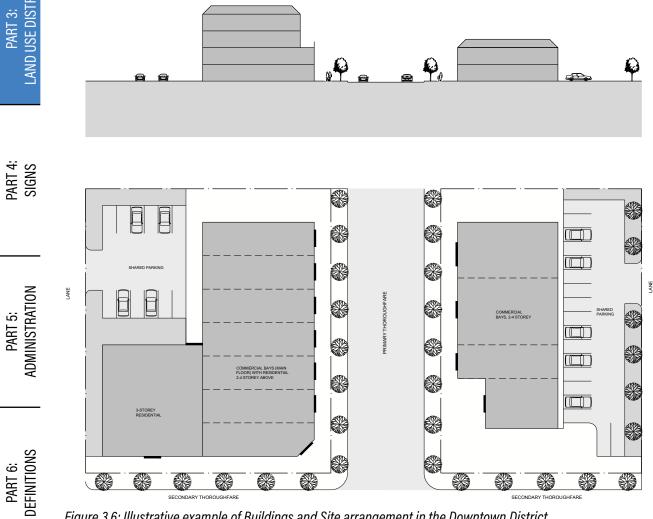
Illustrative example of Buildings and Site arrangement in the Downtown District
